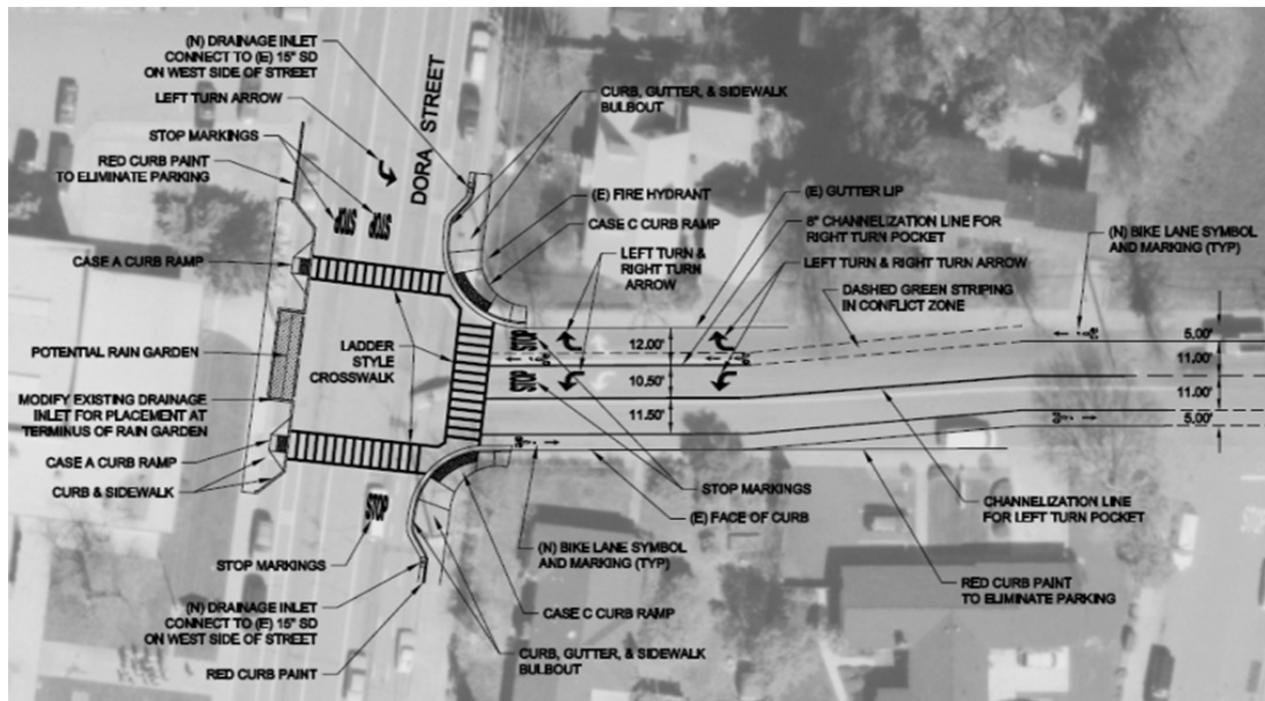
Preliminary concept plan (partial) for W Gobbi Street bike lanes and intersection improvements at S Dora Street. Complete engineering concept plans are provided in the individual school travel plans in Appendix A.
